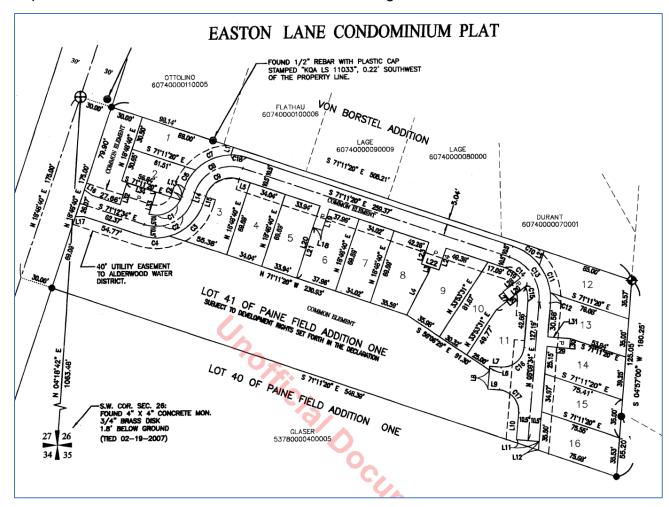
Easton Lane Layout (Adapted from AFN 200809155218)
